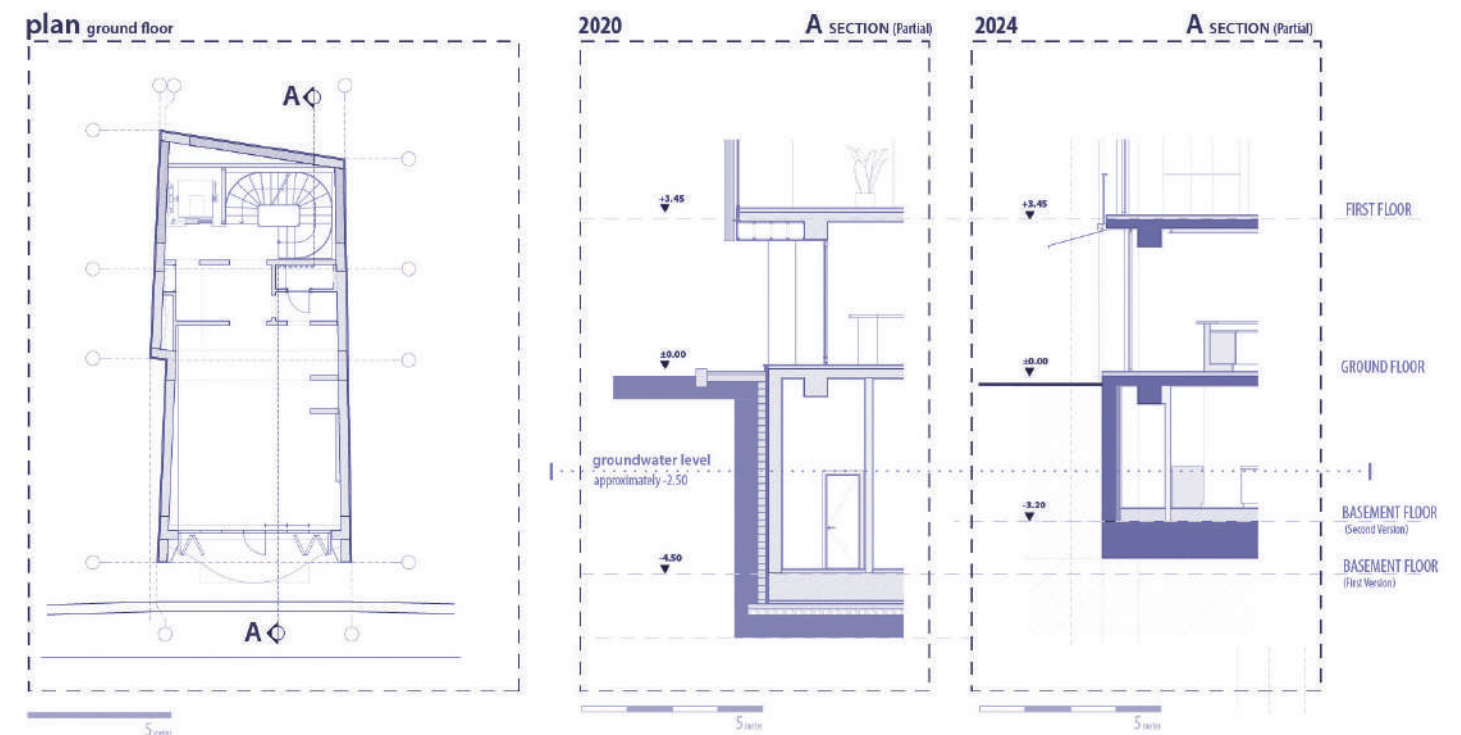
Foundation drawings of the Karaköy project: the initial 2020 design (left) and the revised 2024 basement AA Section (right), adapted after recurring encounters with groundwater. (Author, 2025)
